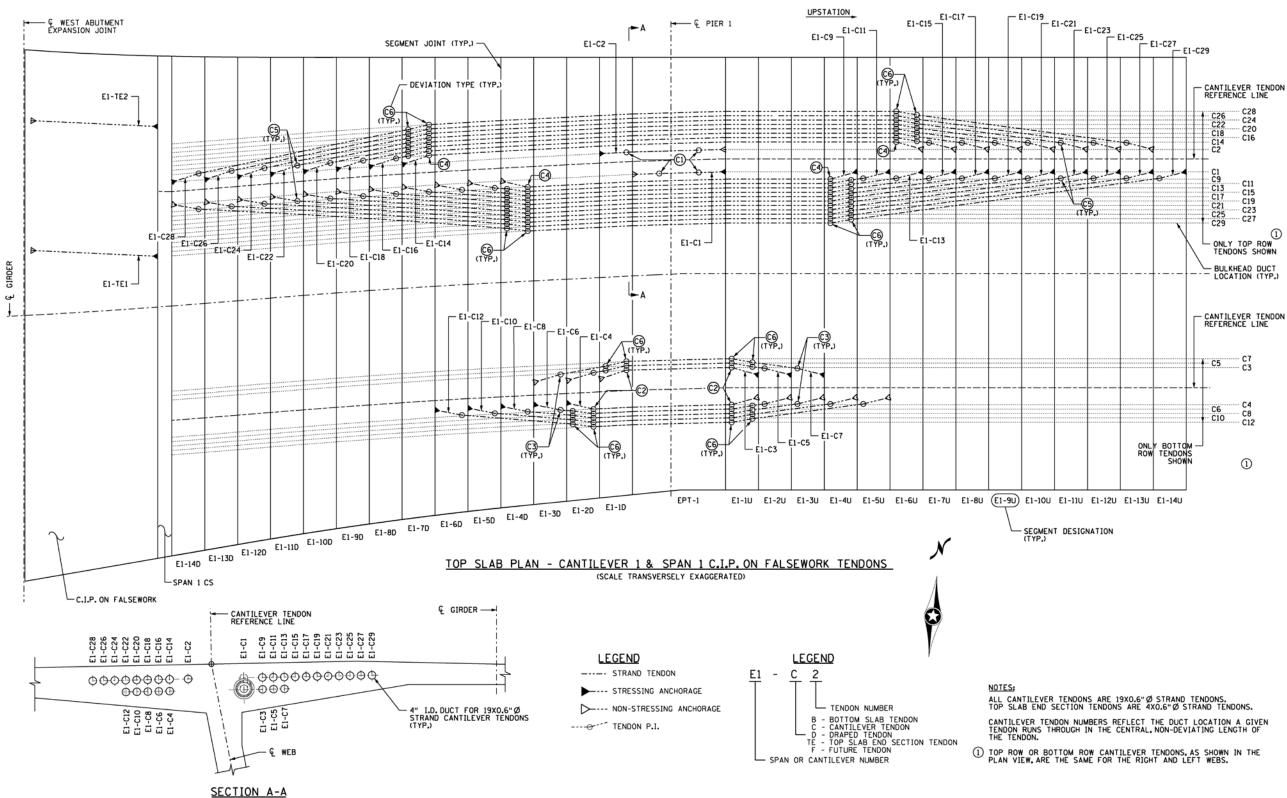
Eastbound Cantilever 1 and Span 1 C.I.P. Cantilever Post-Tensioning Layout
